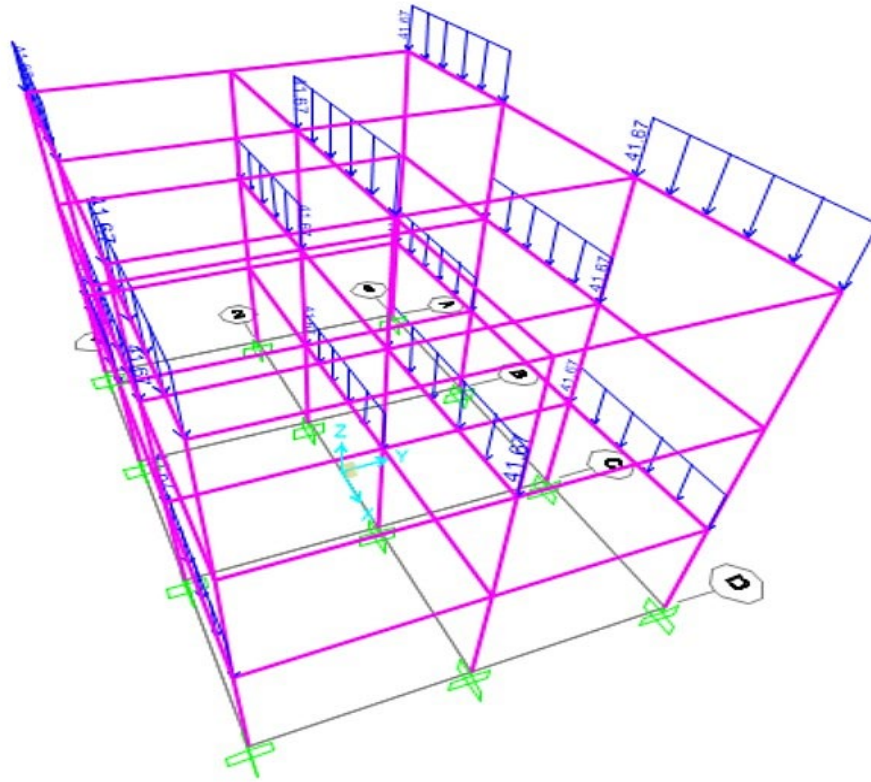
Building frame with impact load on ground-level column and pulsating vertical load on top
